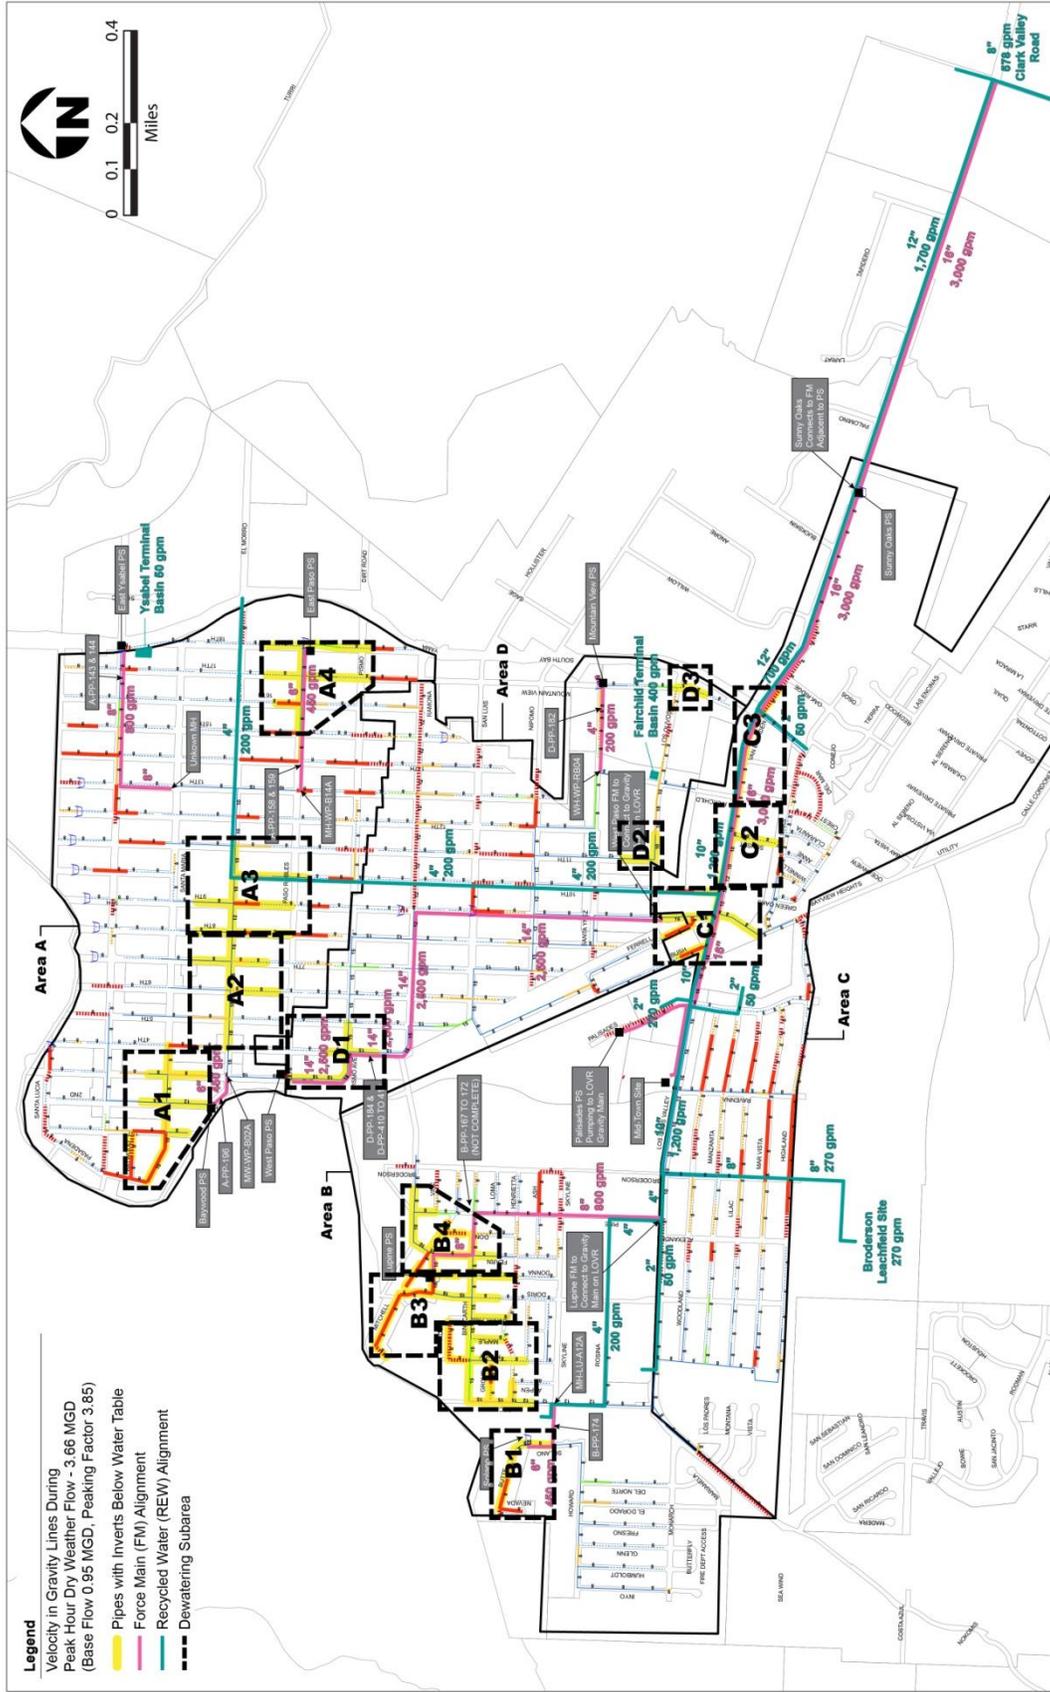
Los Osos Wastewater Collection System – Sewer Areas with Shallow Groundwater
